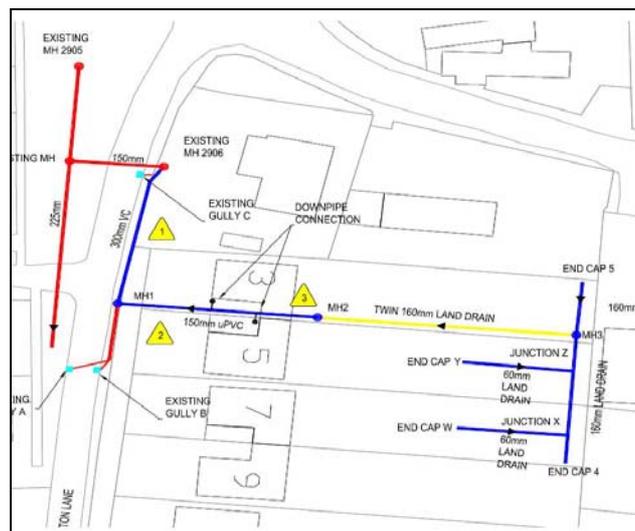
Design layout showing use of existing culvert (courtesy of Daventry District Council)
